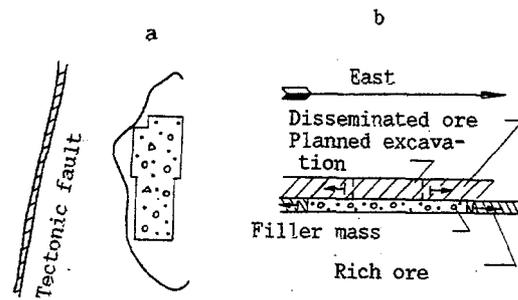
Plan (a) and transverse cross-section (b) of a mine.
